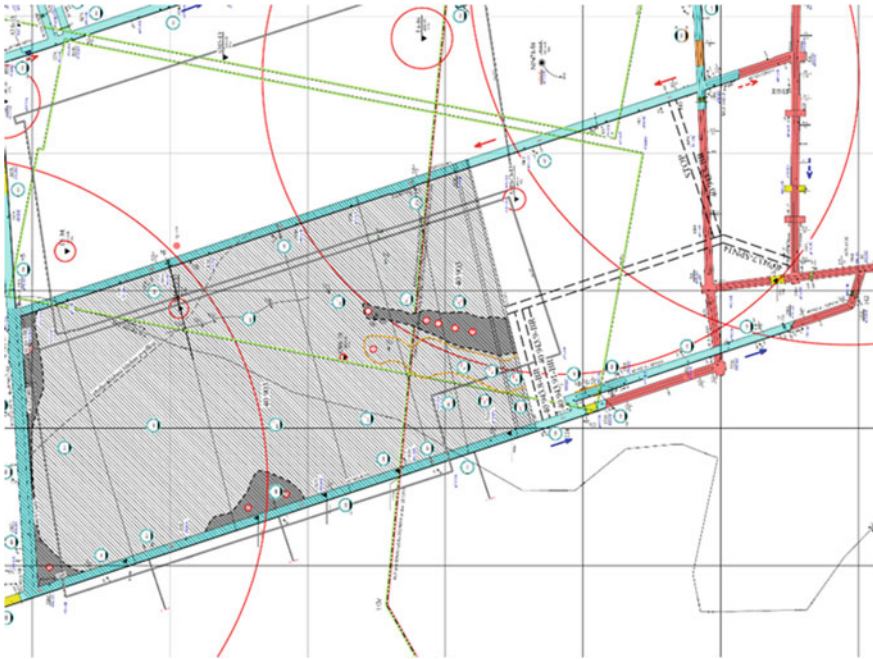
Excavating the dividing class and shortening the Longwall Face No. 40 903
